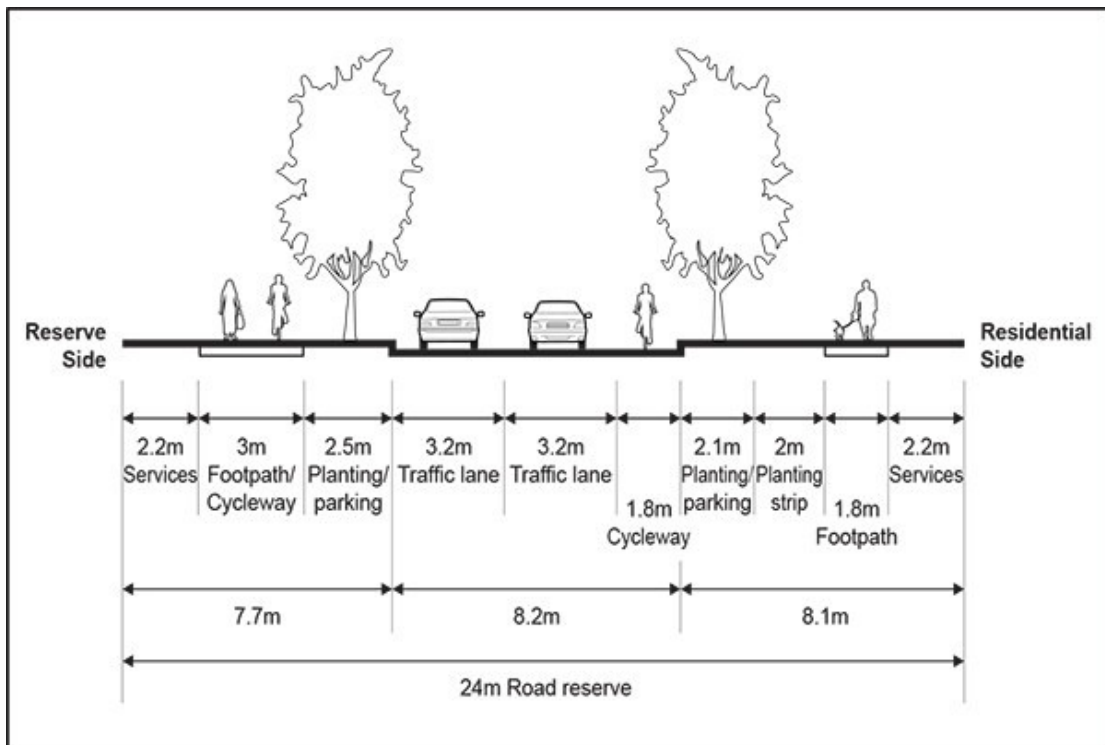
Orewa 2 precinct - Collector road park edge
